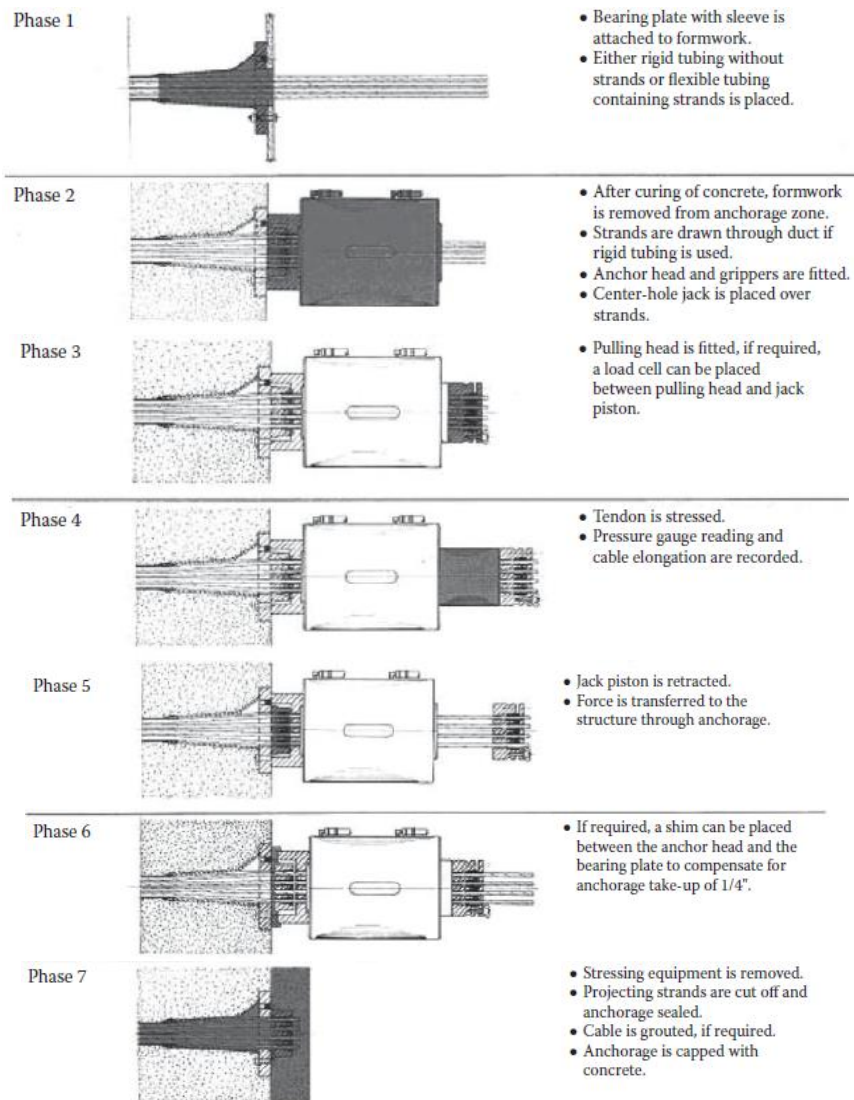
Jacking procedure for post-tensioned girders (Duan and Chen 2014)
